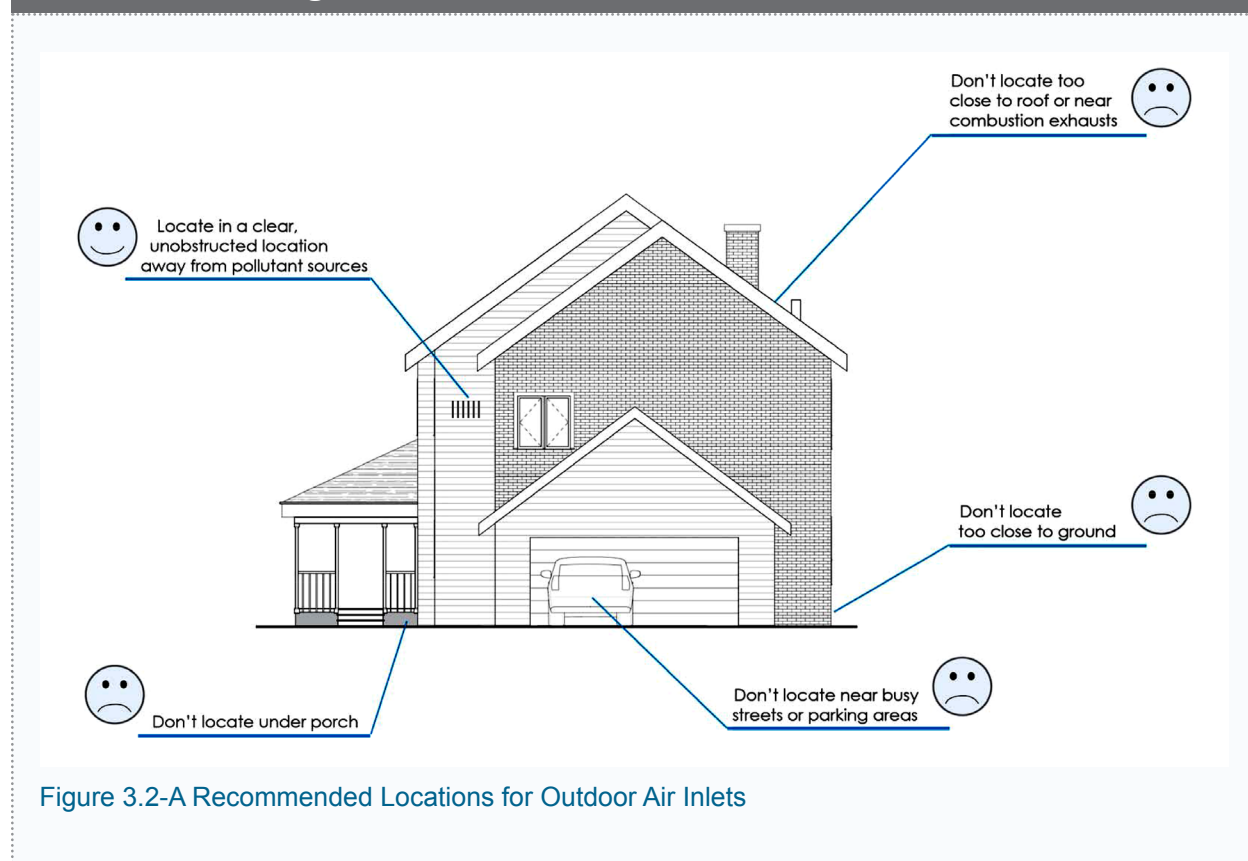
A Recommended Locations for Outdoor Air Inlets
